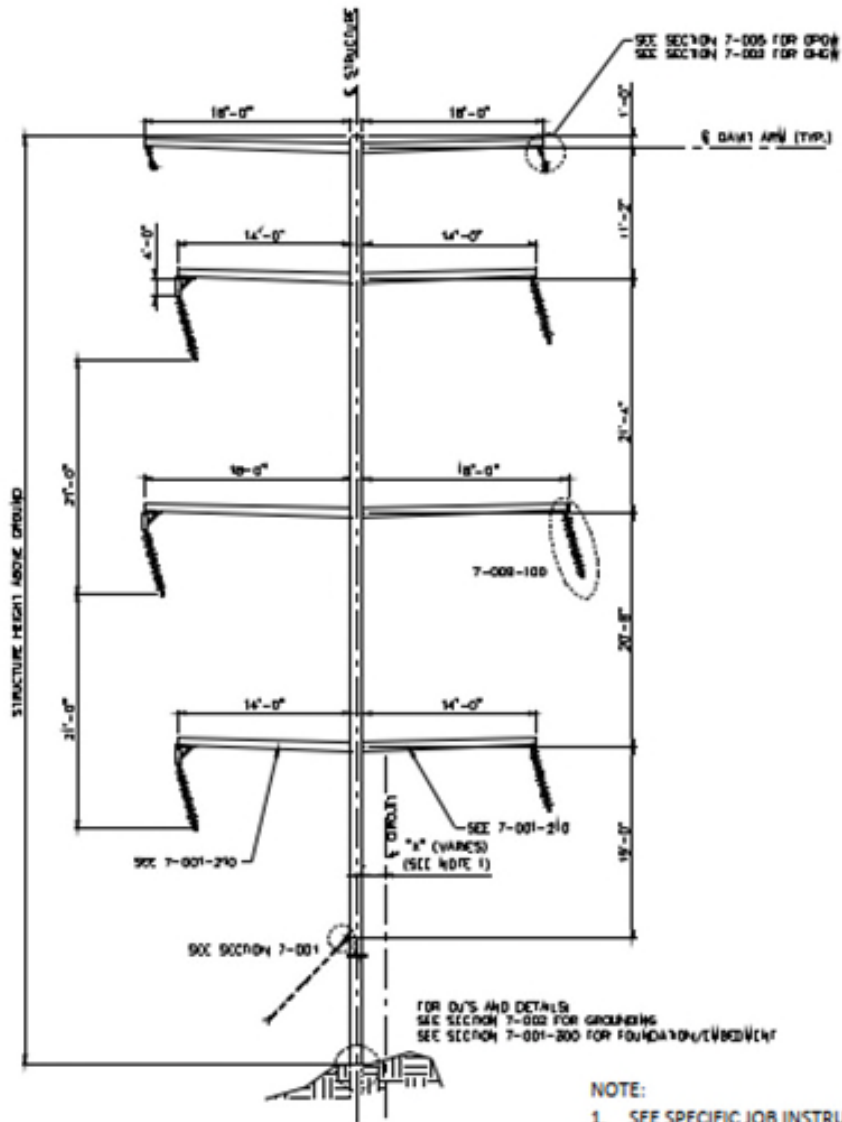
Typical 230 kV Long Span Double-Circuit Steel Pole Structure
